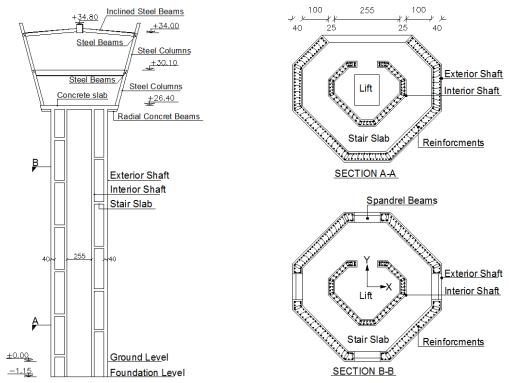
Longitudinal and cross sectional views of Kerman ATC tower
